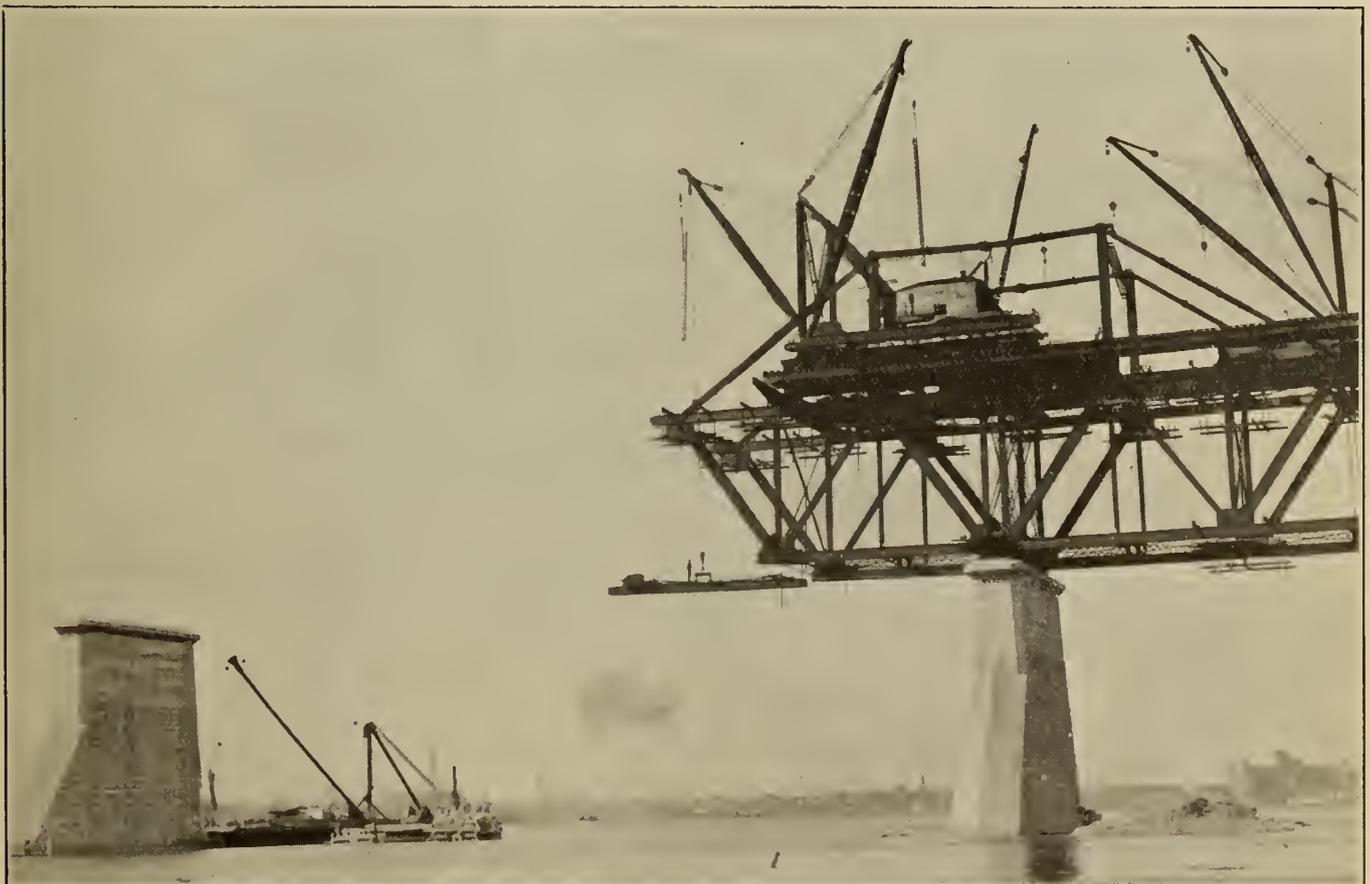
South Approach—Cantilever Erection of 245-foot Spans—Fourth Stage.
